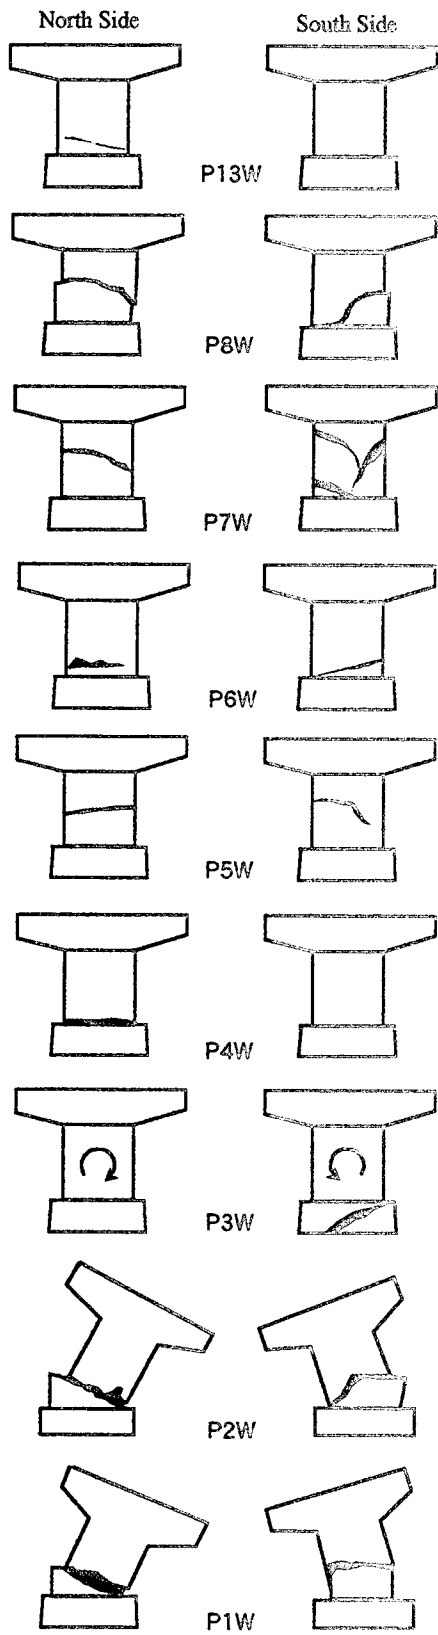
Failure of Piers, Wu-Shi Bridge
